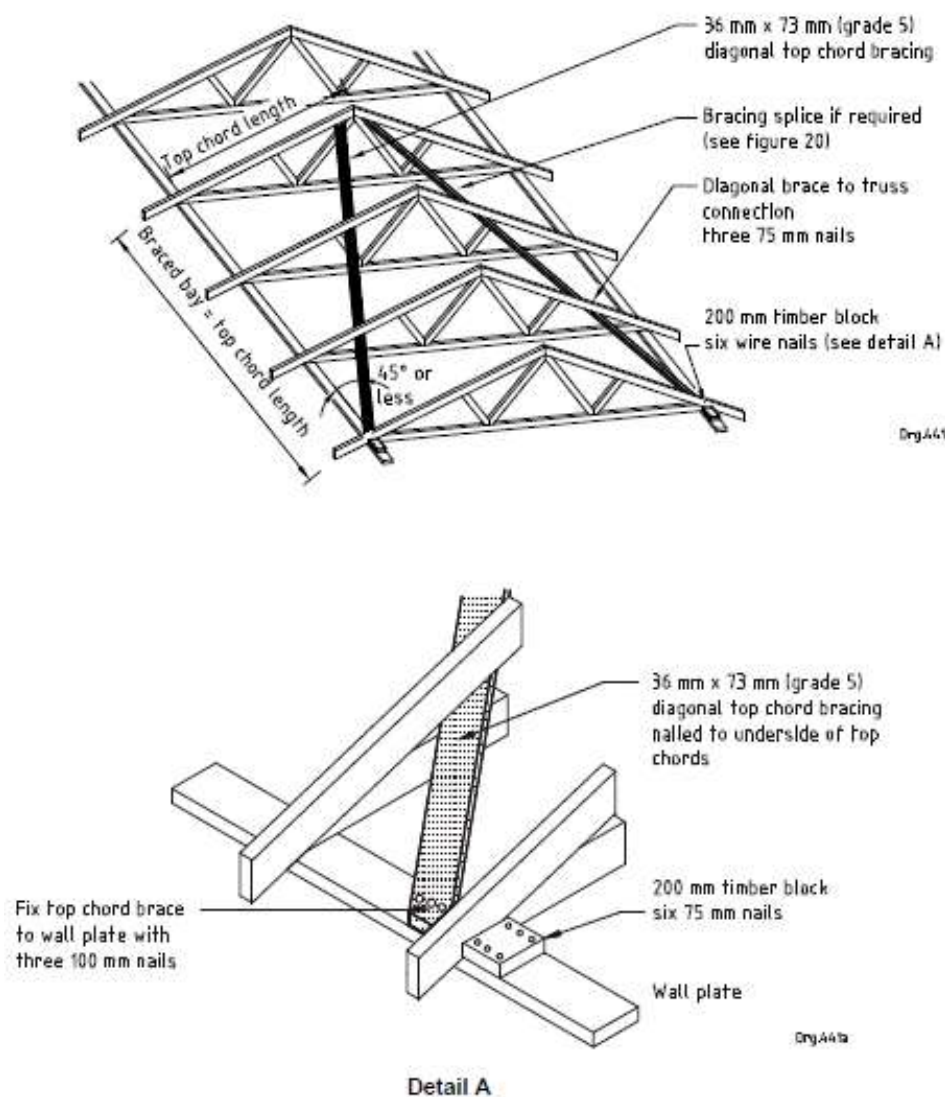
Alternative Top Chord Bracing Connection for Tiled Roofs that have a Clear Span that does not Exceed 6.6m
